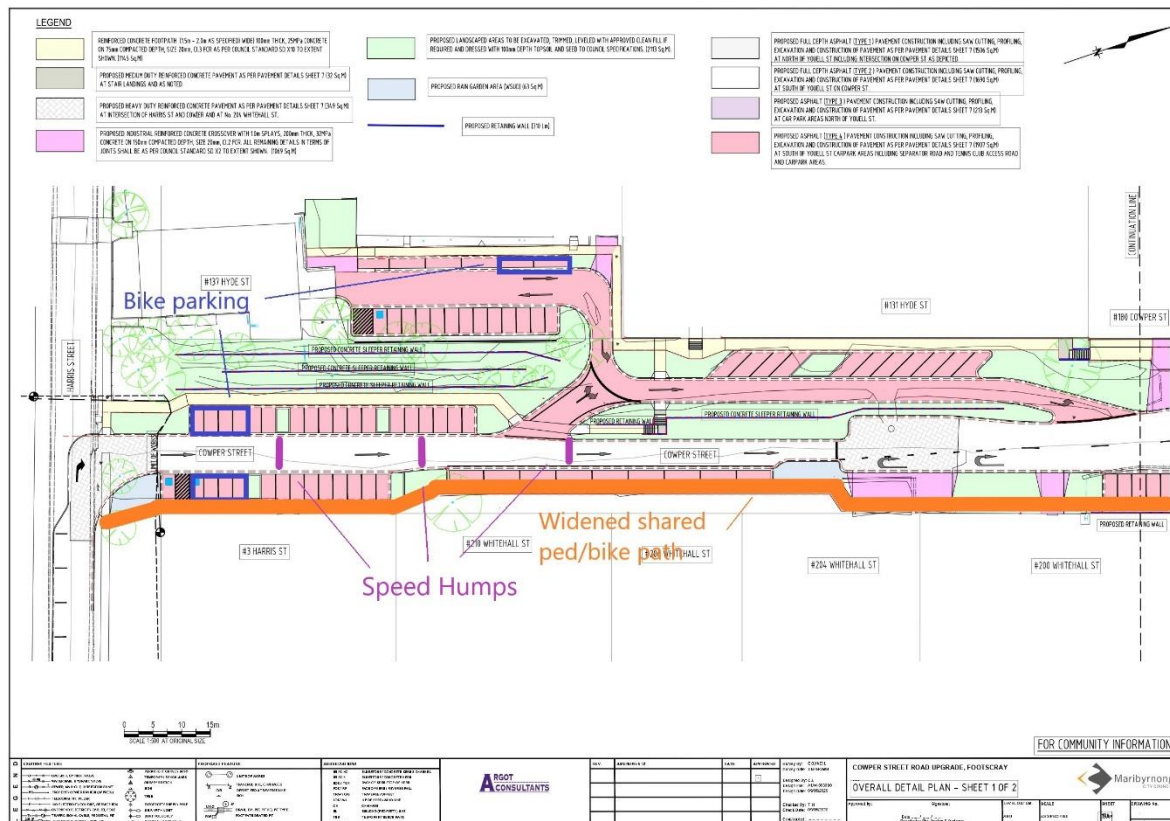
Proposed Alterations to Proposed Cowper St Plan
